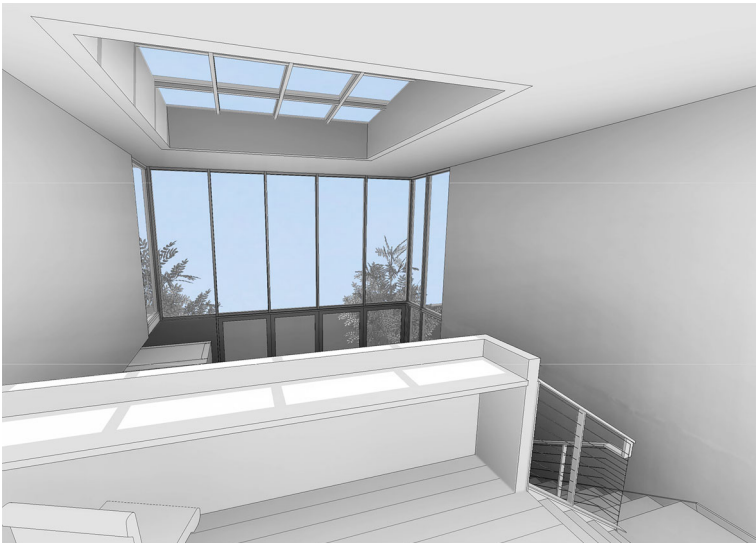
A view from a family room on the upper floor to a living room on the ground floor
